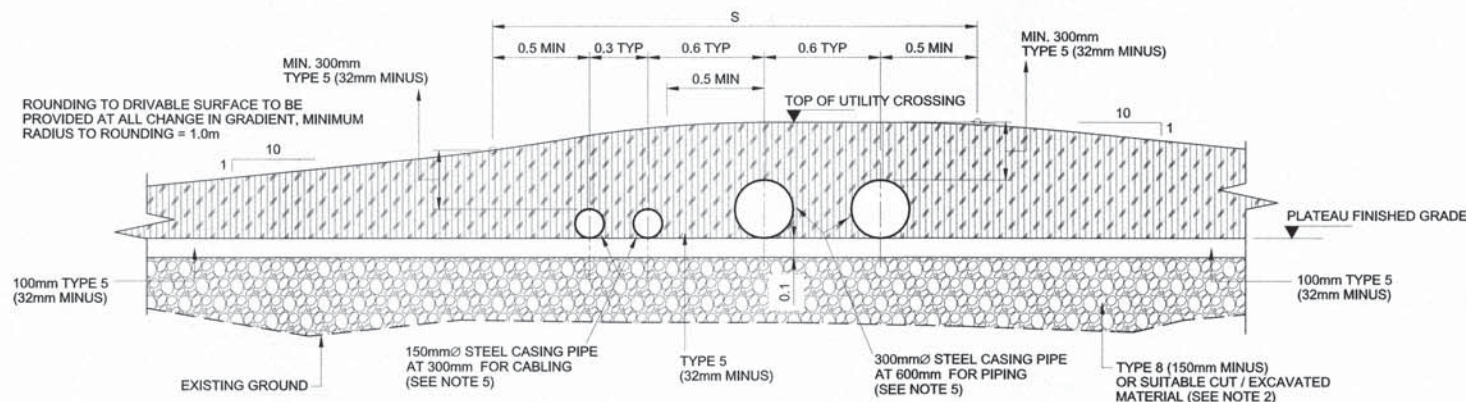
UTILITY BERM ON EXISTING GROUND
